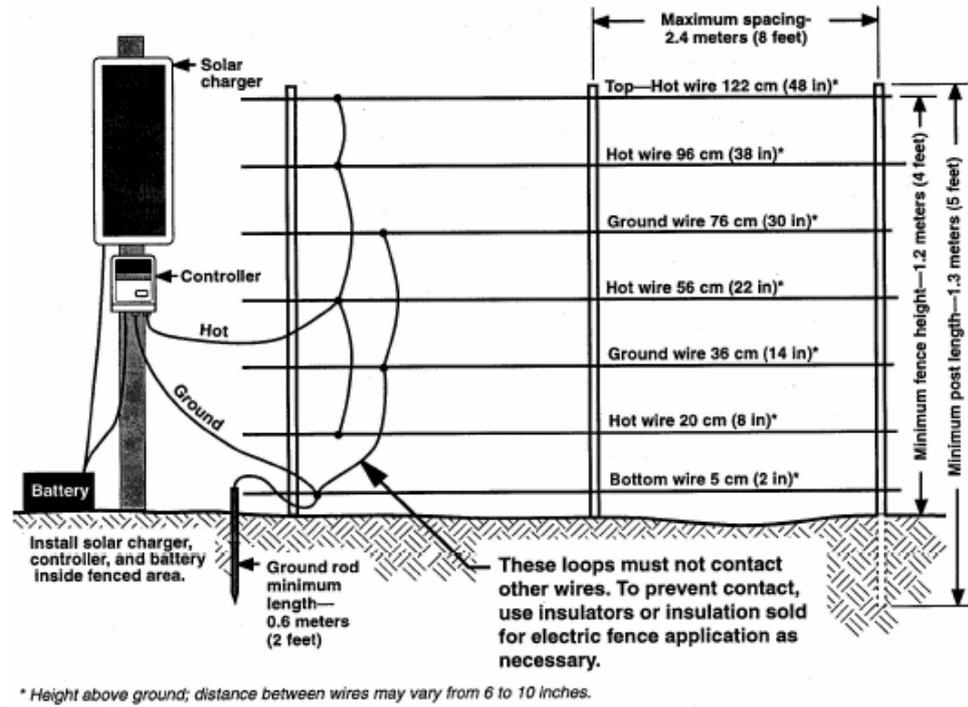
Construction details of an electric fence (Gasvoda, 1999)
